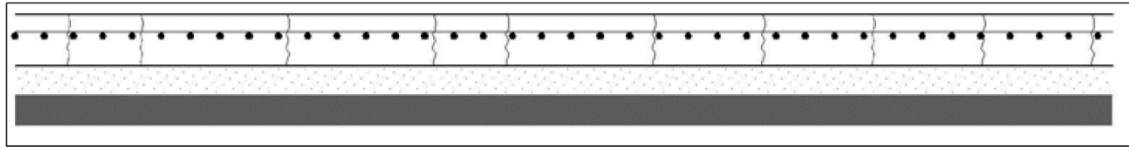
Continuously Reinforced Concrete (CRC) pavement (Source: SAPEM, 2013d)
